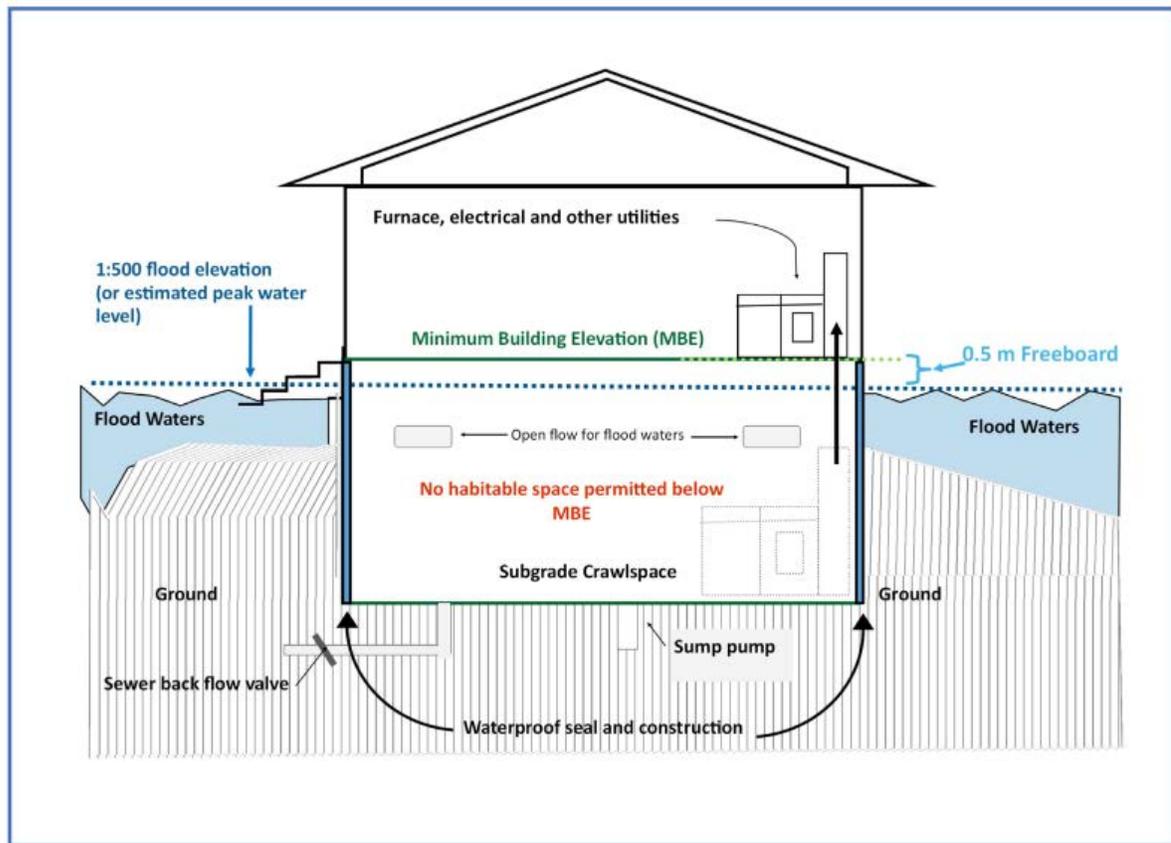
Minimum Building Elevation Diagram, SPI Handbook, 2022.
